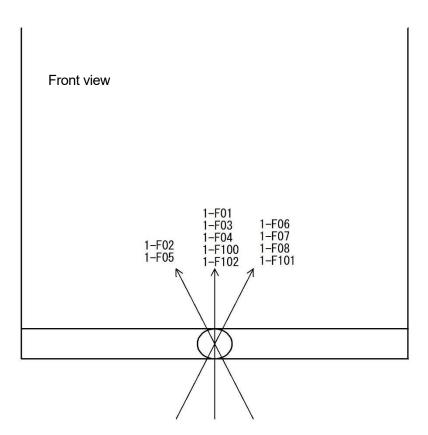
Diagram of photography points at Mouth of Pit No. 1
